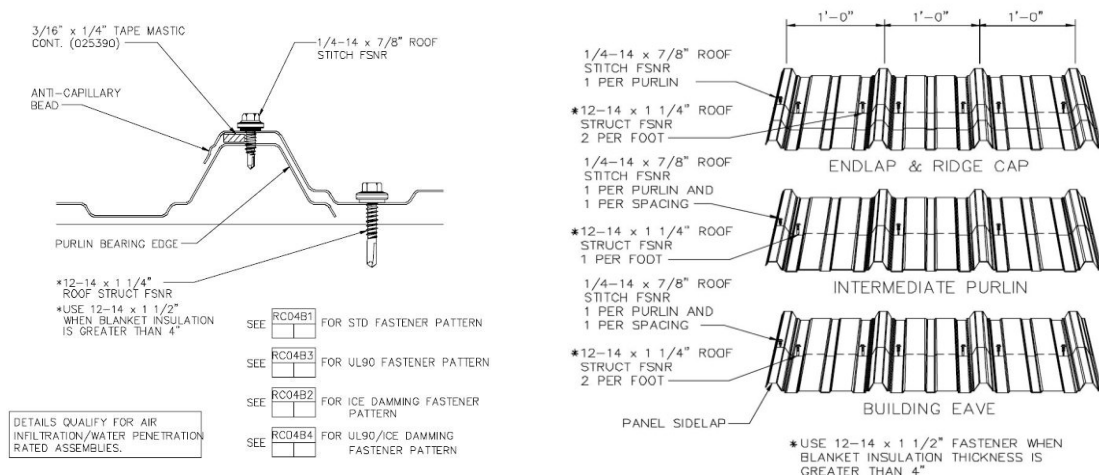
Typical through fastened panel detailing for roof and walls [105]
